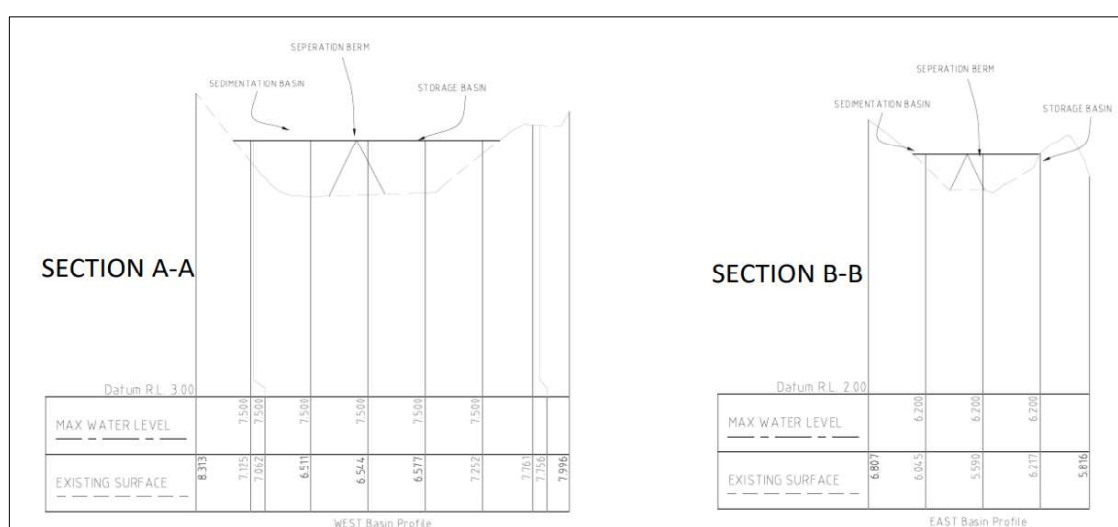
Basin cross-section design plans (Source: SITEC 2024).
